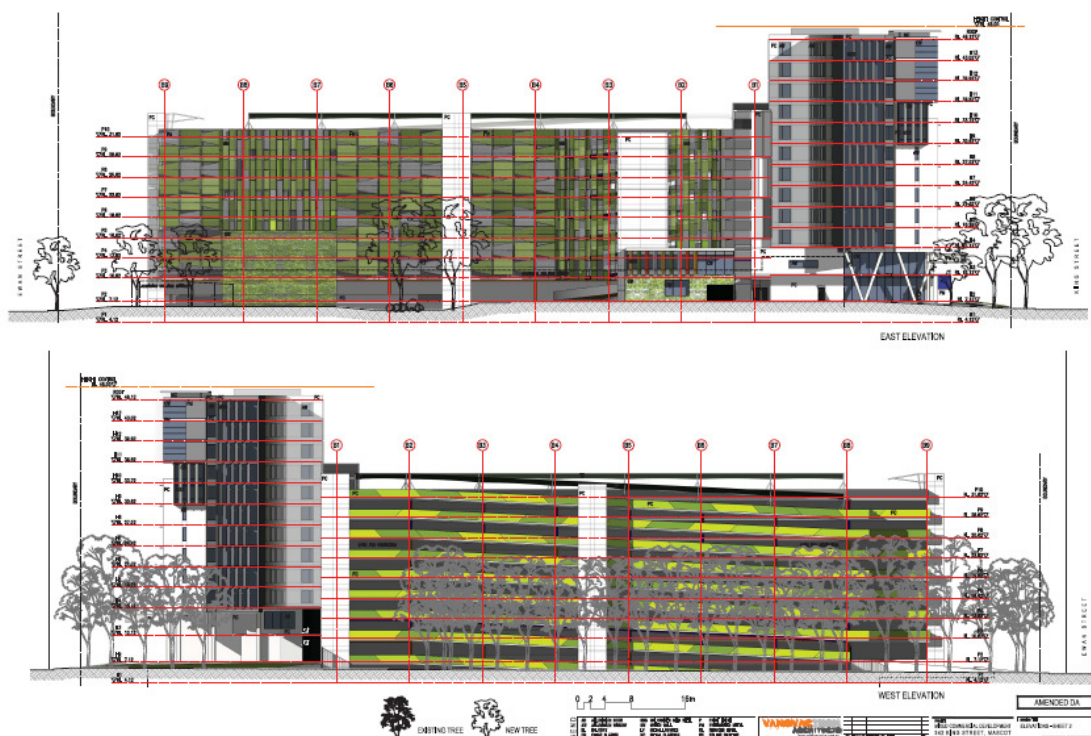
Eastern and Western elevations of proposed hotel and carpark.
